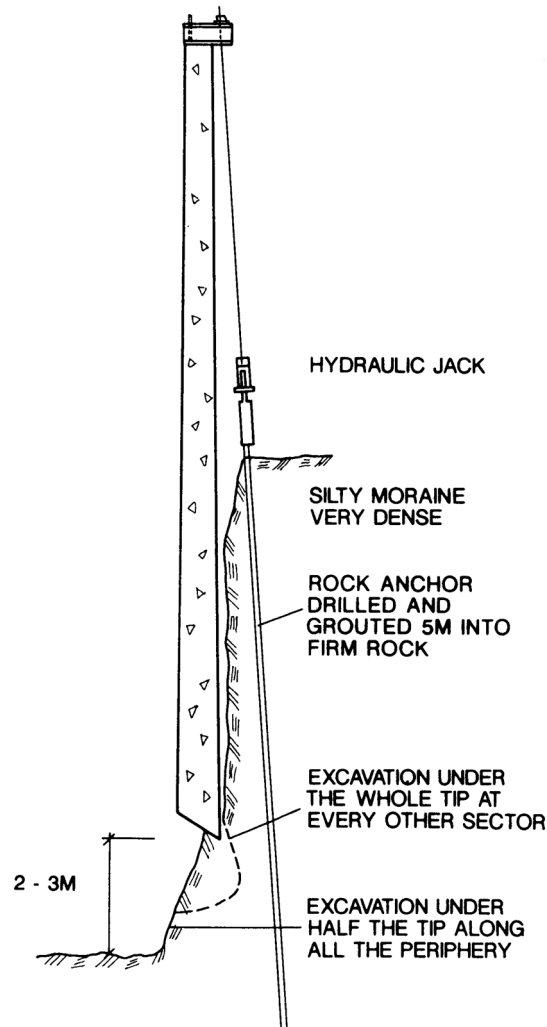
SECTION THROUGH CAISSON WALL DURING SINKING.
